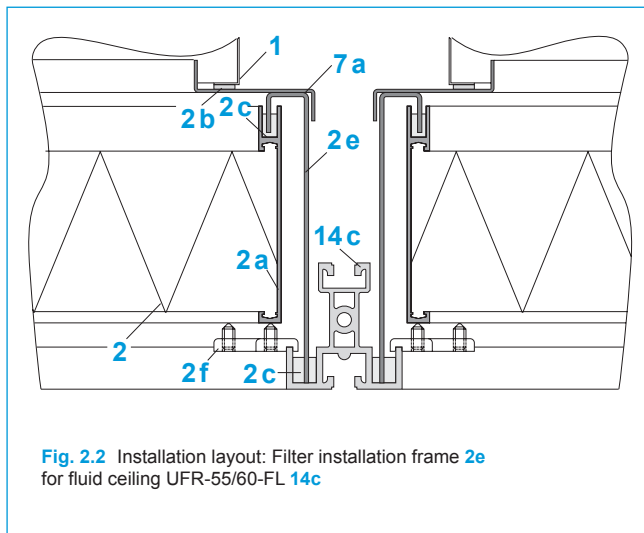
Installation layout: Filter installation frame 2e for fluid ceiling UFR-55/60-FL 14c
